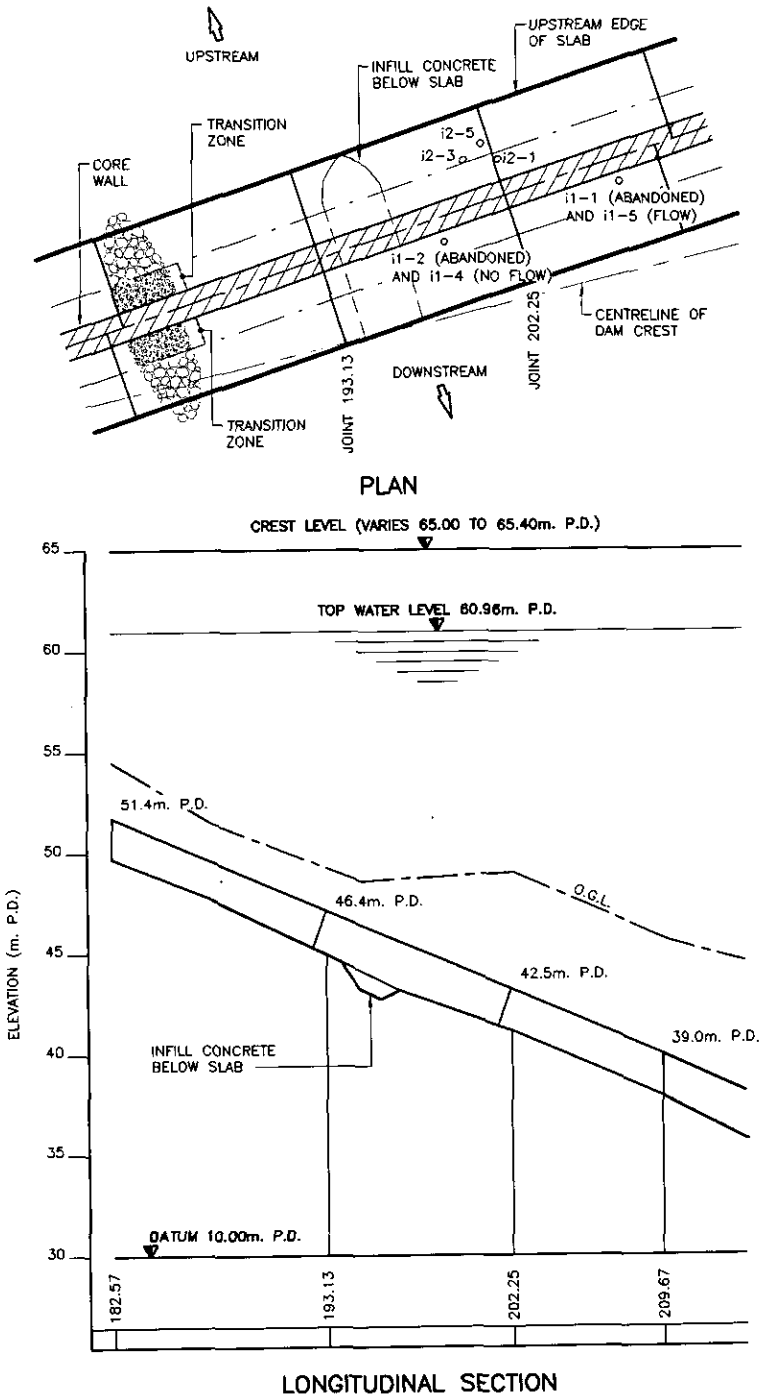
Plan and longitudinal section of base slab in probable area of leakage
